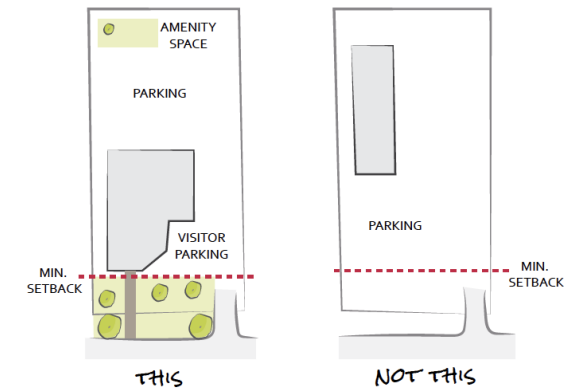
Avoid large parking areas between the building and street (7.4.a).
